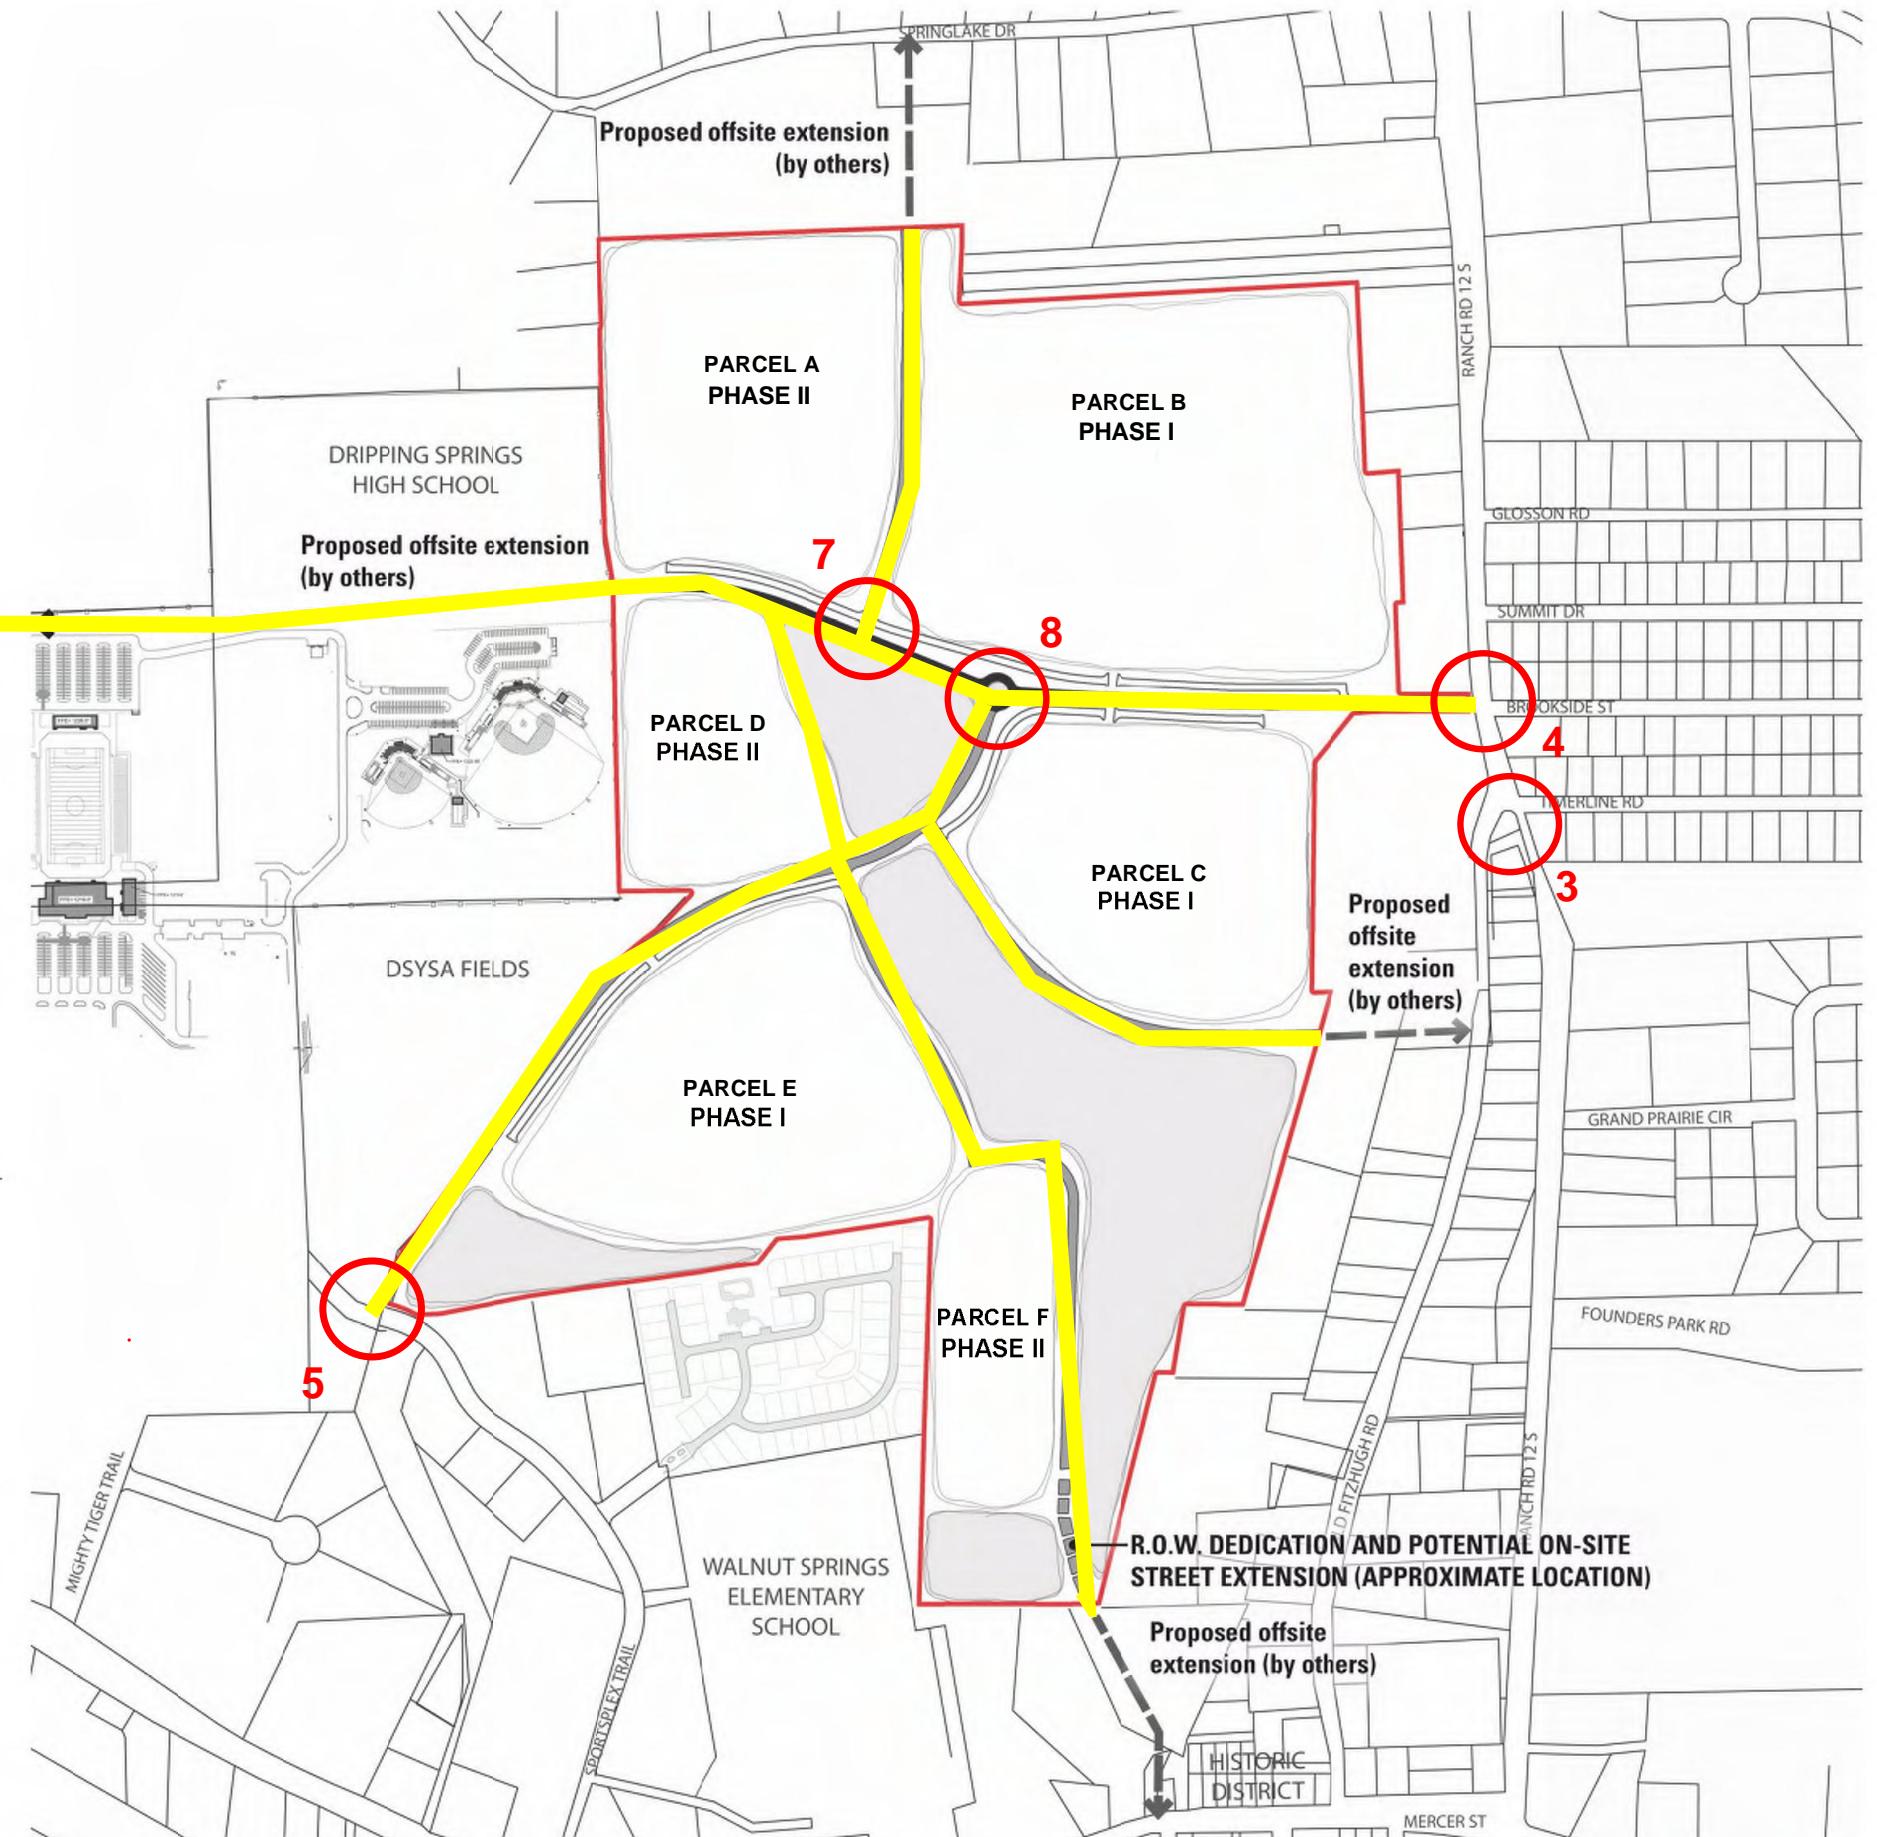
EXHIBIT F - PD STREET STANDARDS - REFERENCE PLAN
